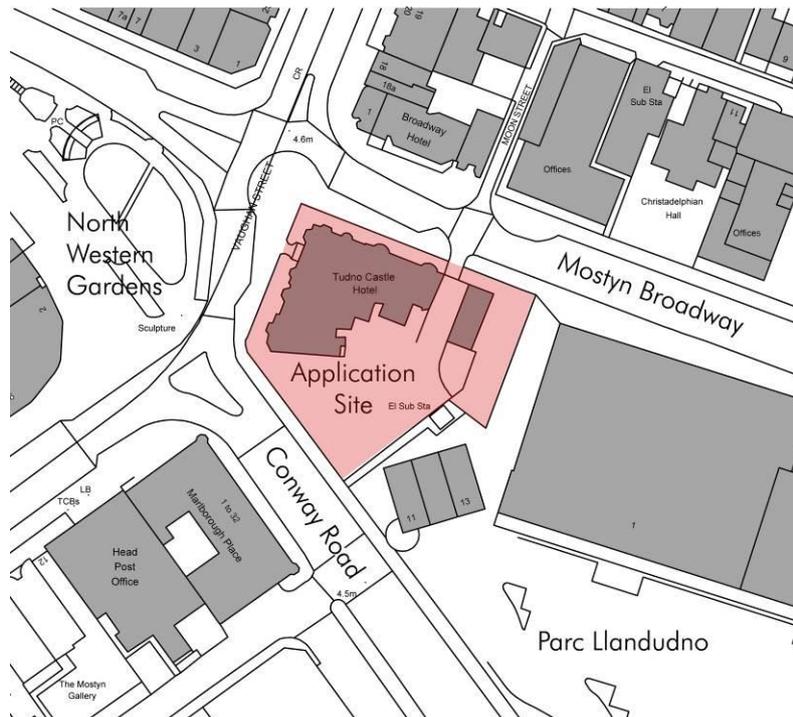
A block plan highlights how the Vaugh Street façade completes the enclosure of the North-Western Gardens.
